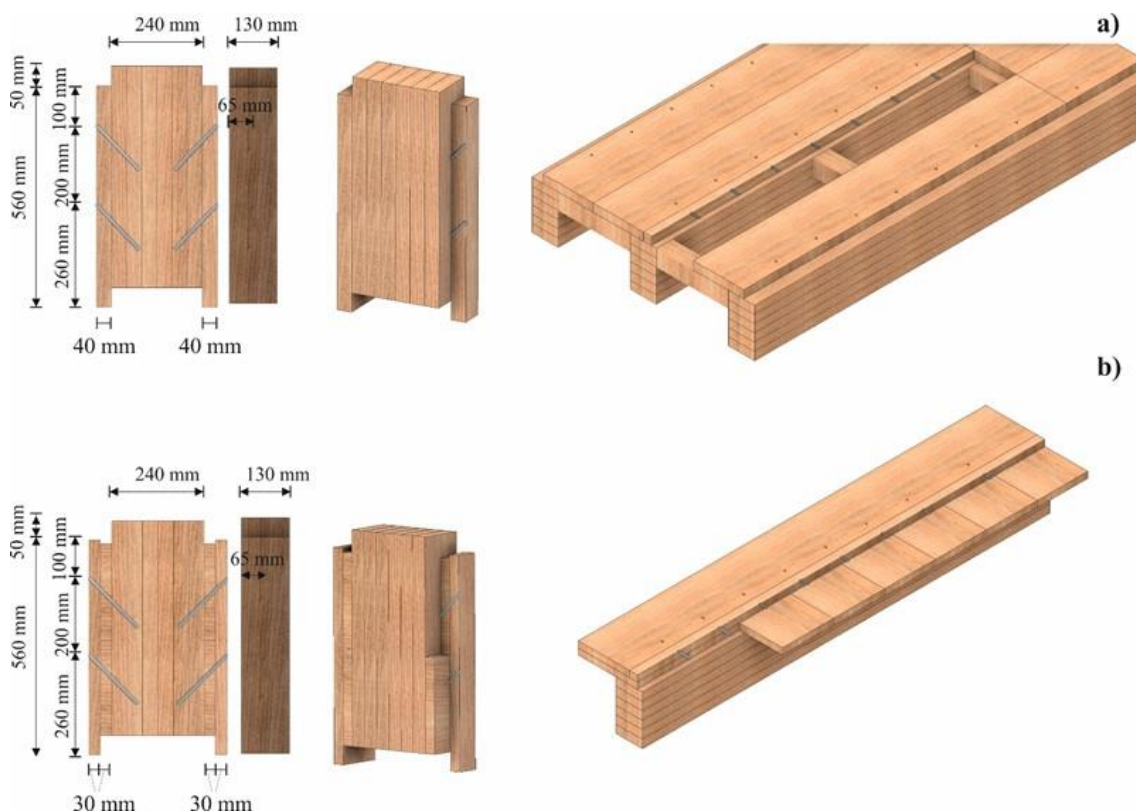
Push-out specimens and related floor scheme: a) Series 1: single layer of planking with floor joists; b) Series 2: double layer of cross planking.
